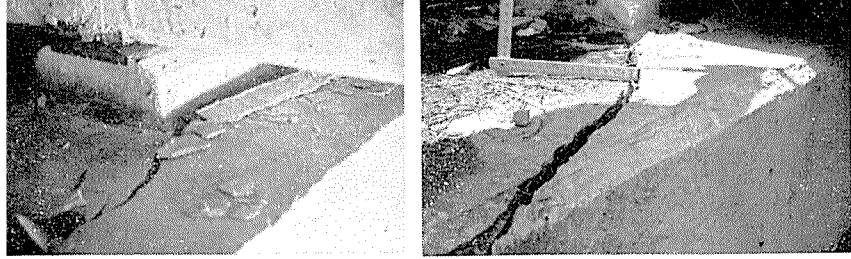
Cracking of abutment (Komatagawa Bridge) (Post-tensioned)
